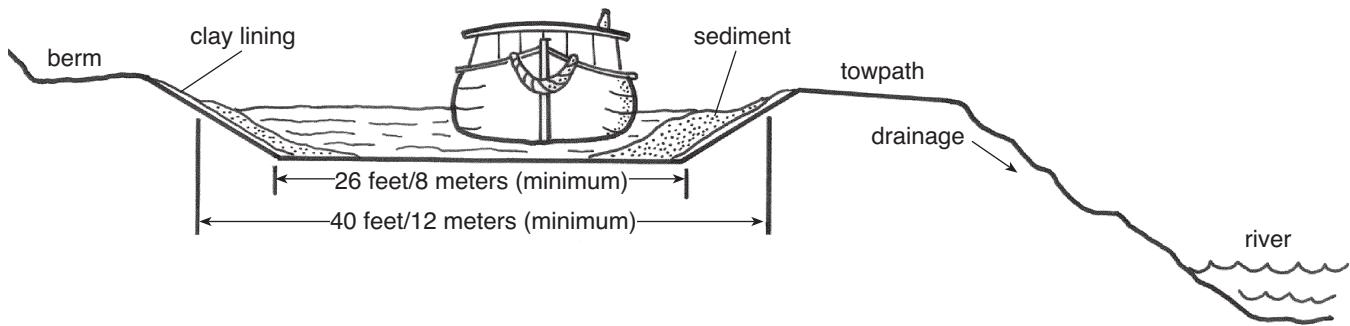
Cross section of a typical canal. Original configuration is shown, along with infilling sediment. The walls of the canal were either lined with clay or protected by a rock lining. The bottom also was lined with clay. Water depth in the canal was a minimum of 4 feet (1.2 meters). The canals had to be dredged constantly in order to keep them passable. Aquatic vegetation (not shown here) was an additional problem. Towpaths were slightly inclined so that they would drain away from the canal.
